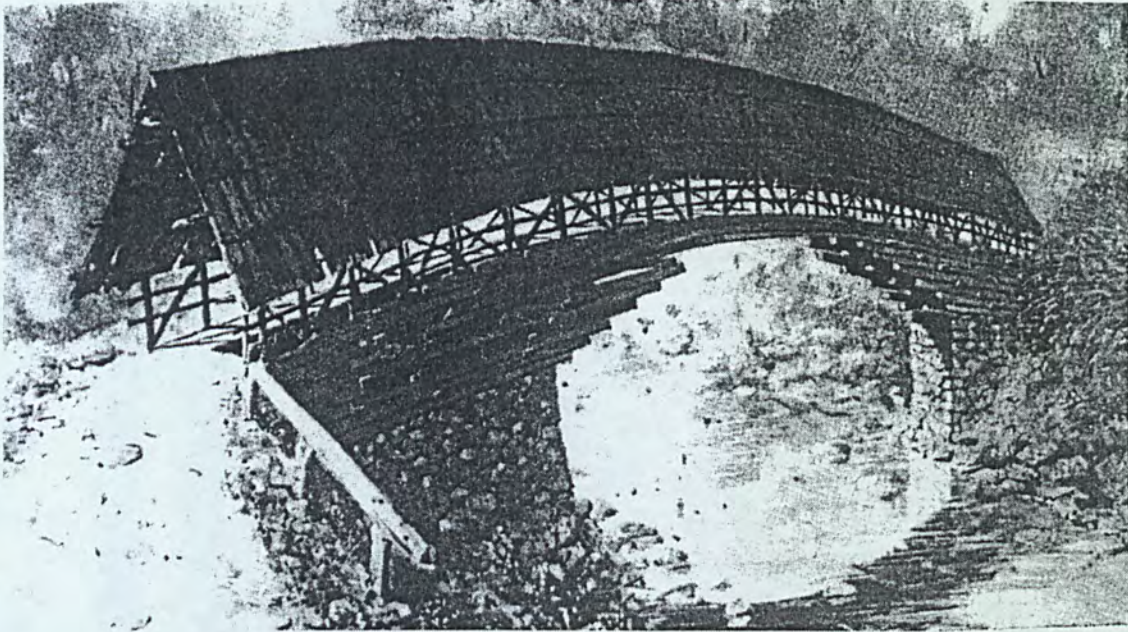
Water-color painting of the old wooden bridge over the river Prača (Čelić and Mujezinović, 1969).
